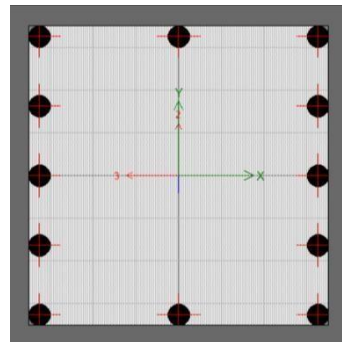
Full CFRP Retrofitted Column (375*375mm)
